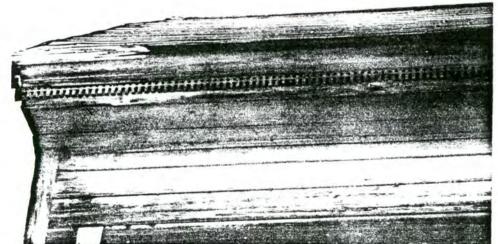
Woolard-Perry House, East Elevation, cornice detail, March, 2000
